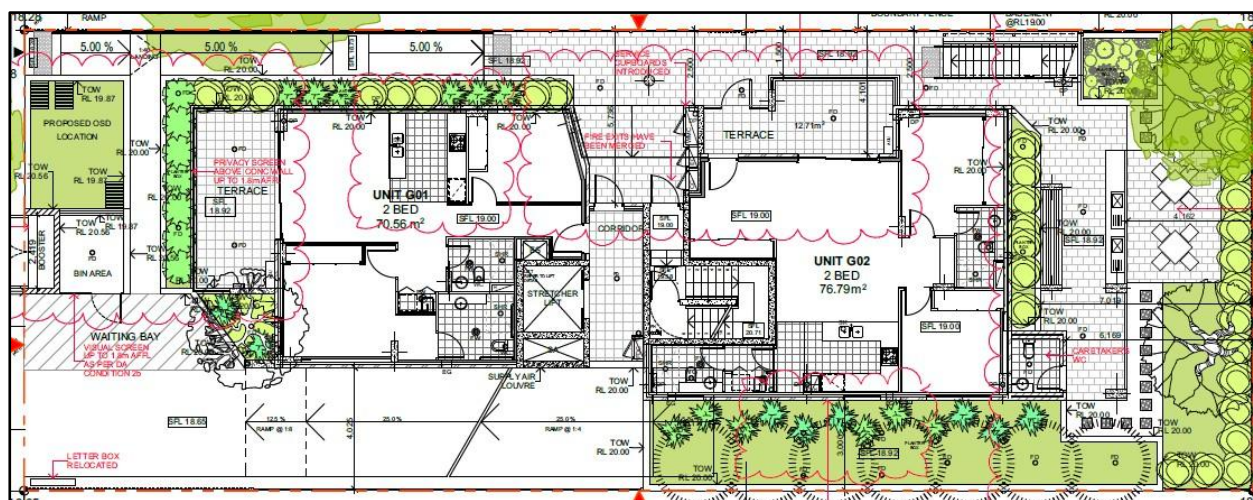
Approved Ground Floor Plan (DA-120/2016/D).
